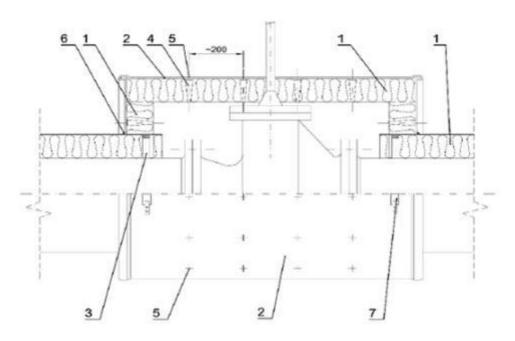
, Flanged valve insulation on horizontal pipework. 1 - Insulation mat, 2 - Insulation jacket, 3 - Supporting structure, 4 - Insulation fastener, 5 - Tube rivet with fastening core, 6 - Sealing with silicone putty, 7 - Cap lock.
